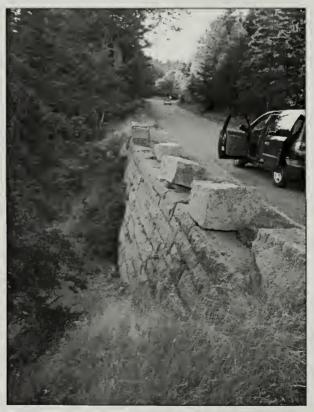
Guardwall/retaining wall employing mortared stonework. Note the skewed and missing blocks on top. (Acad0300_10.203(2), OCLP 2005)
